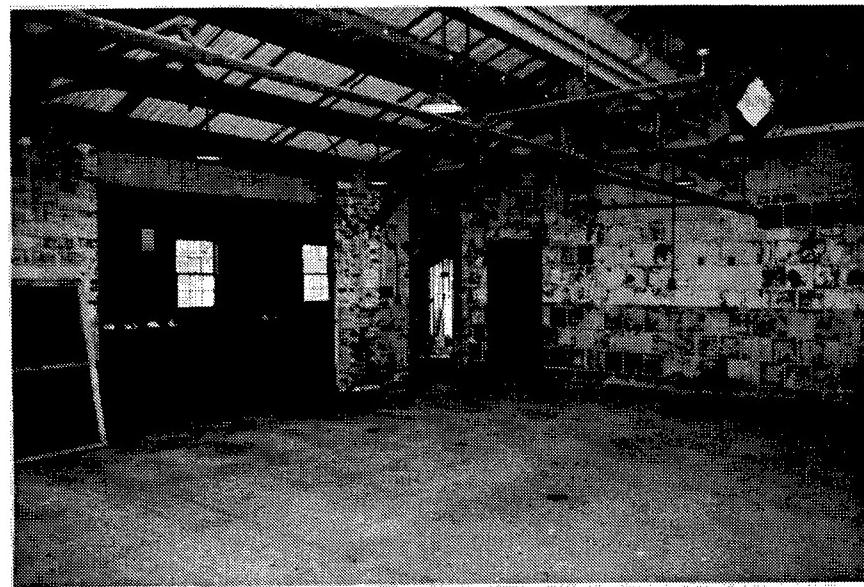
Building 2B-9: Another interior view of a Primer Dry House.
